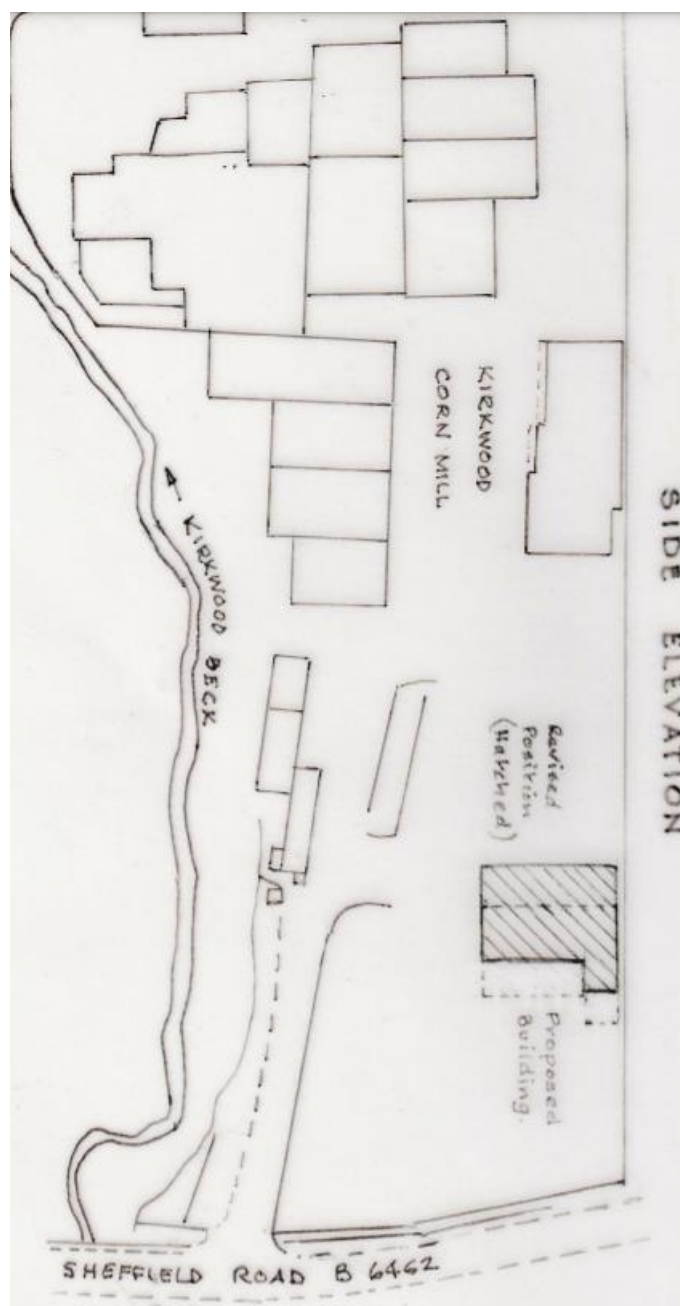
SITE PLAN OF PROPOSED OPERATION
